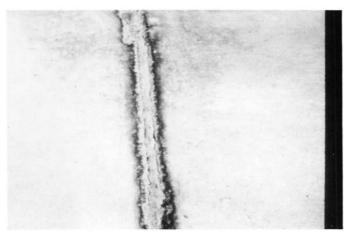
Pumping (Close-Up of Fine Materials Collecting in the Joint)
